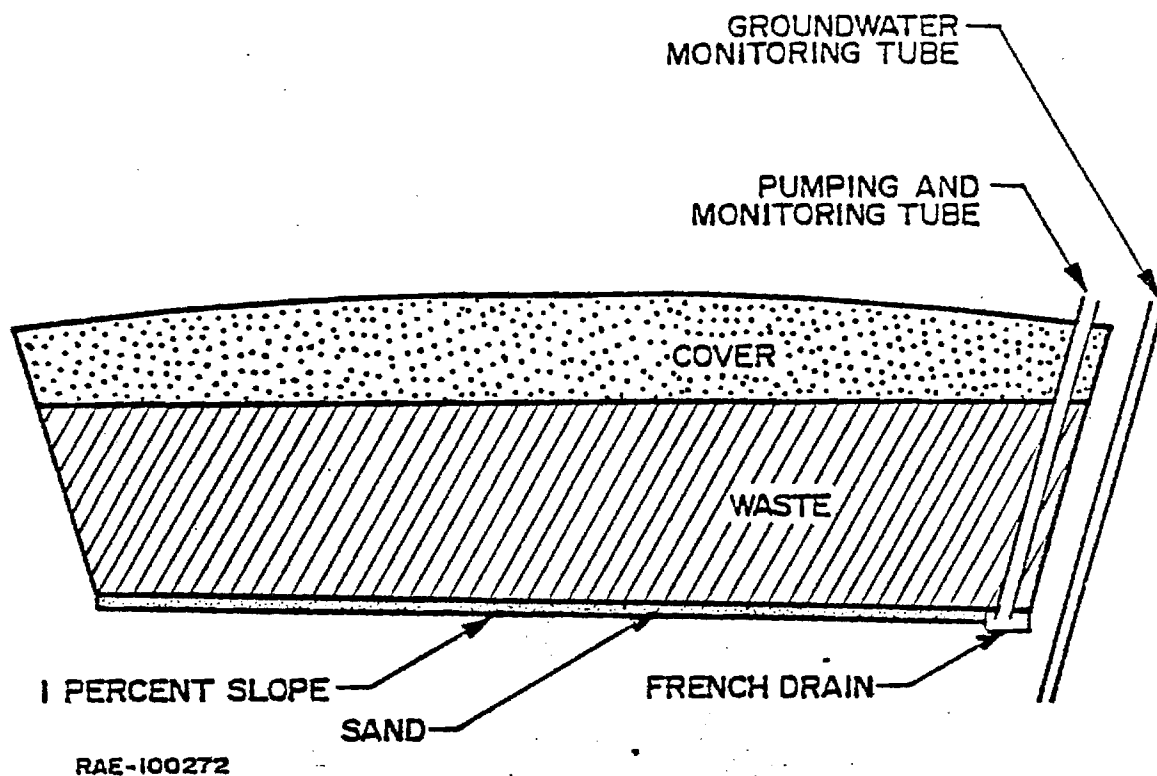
a. CROSS SECTION OF TYPICAL TRENCH
